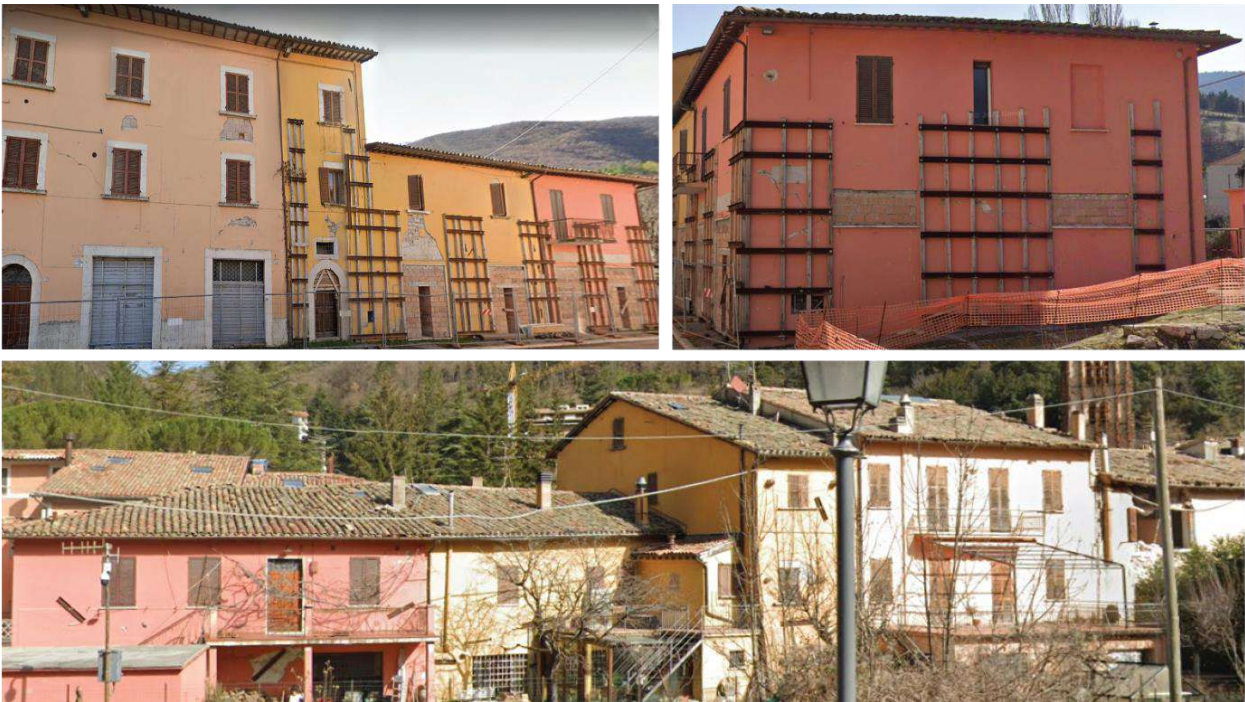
Photo of the building in aggregate, at the top main and side façade (unit U1<sub>A2</sub>), at the bottom back façade.
